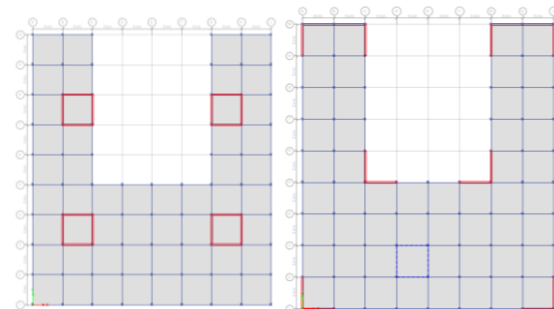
Shear wall at location 3 Fig- 4 Shear wall at location 4
